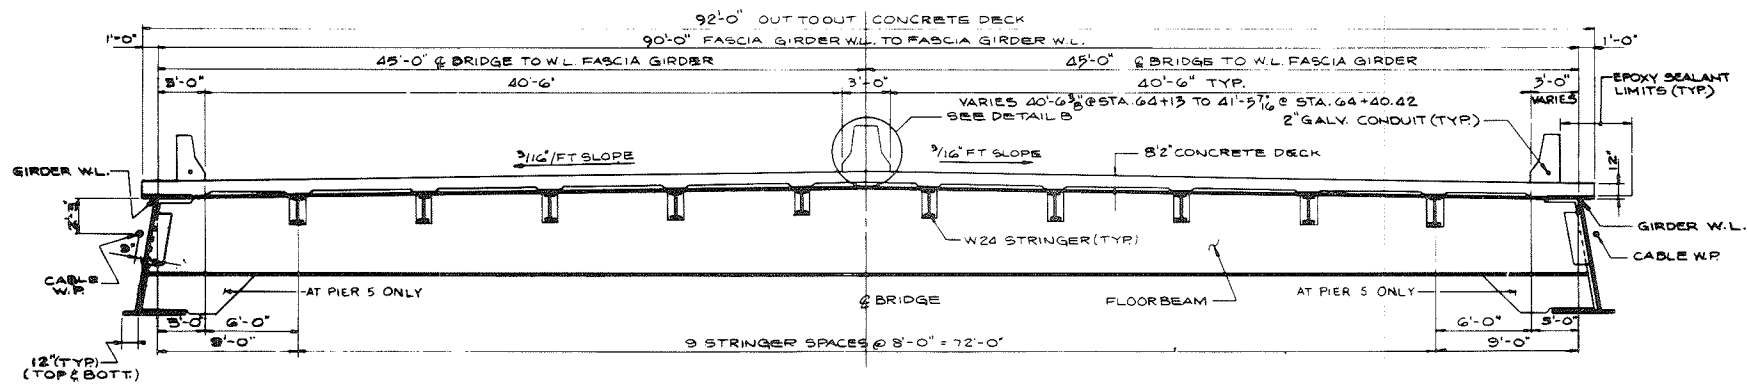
Cable-stayed girder span cross section at floor beam FB2-FB7 and FB9.
